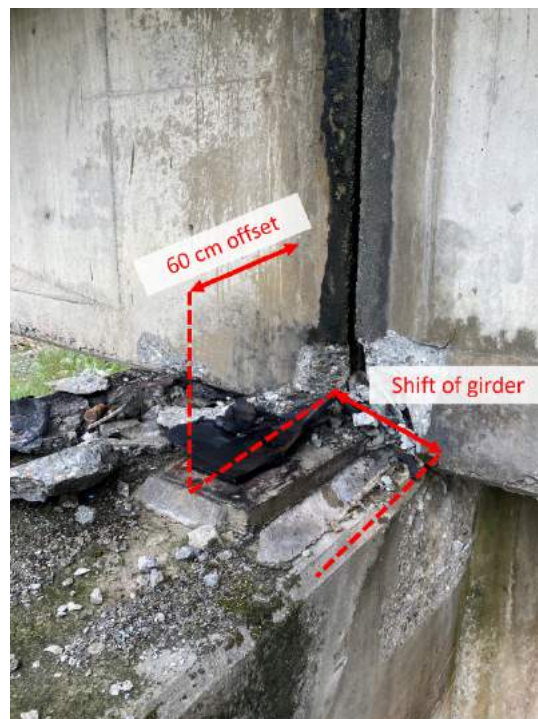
60 cm transverse translation of the bridge girder north, and longitudinal shift of the girder towards the east abutment. (23.21459° 121.27268°)
